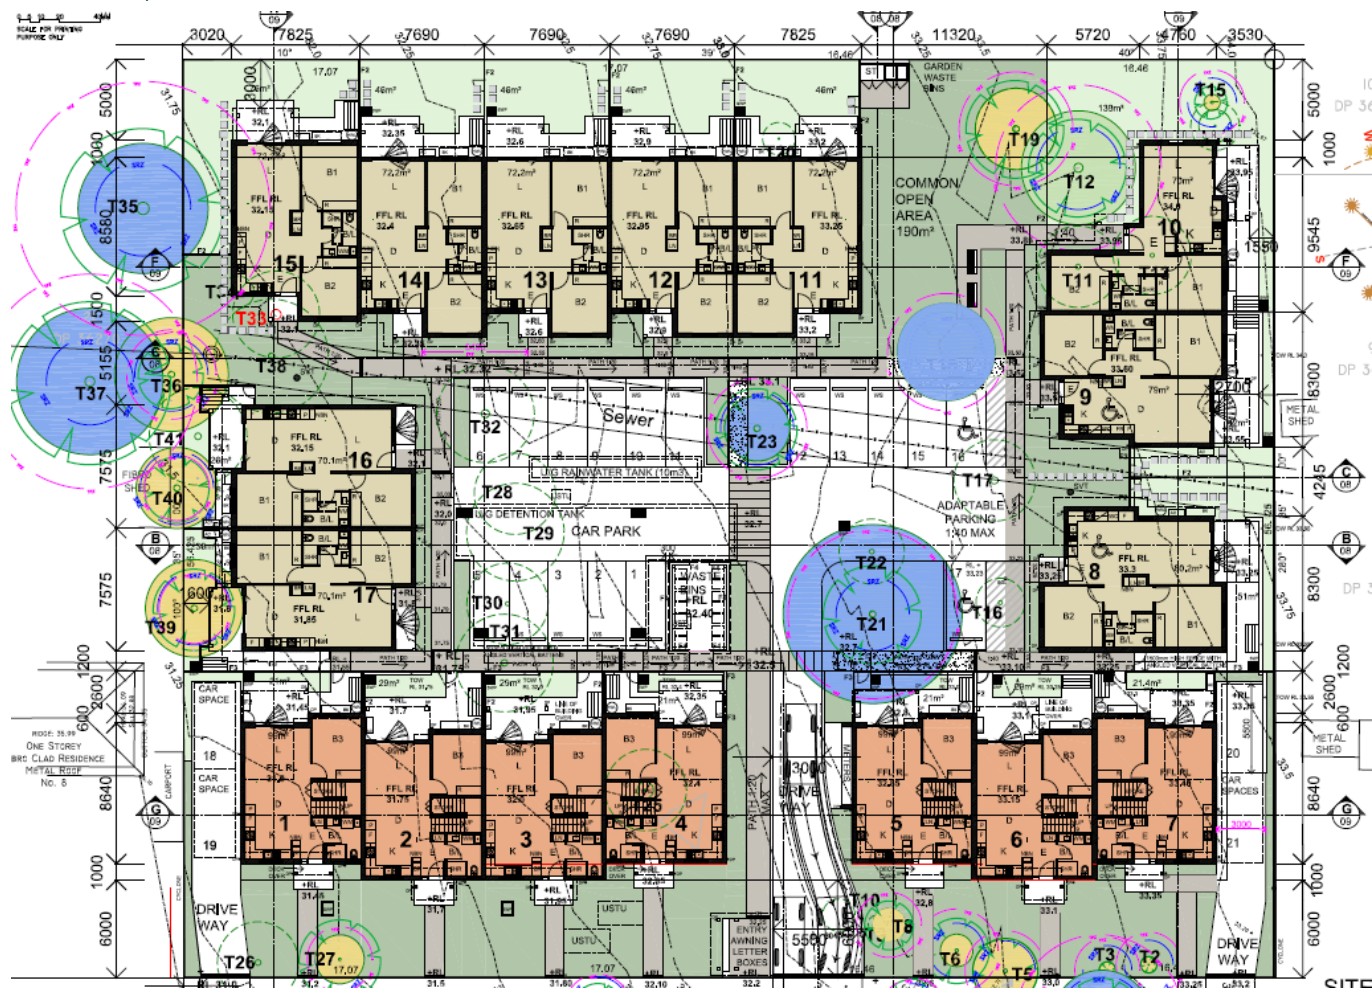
Site Plan (Source: Architectural Plans, Barry Rush & Associates Pty Ltd, dated 27/04/2023)
